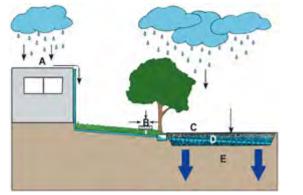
Porous Pavement Application Source: Wisconsin Asphalt Pavement Assoc.
